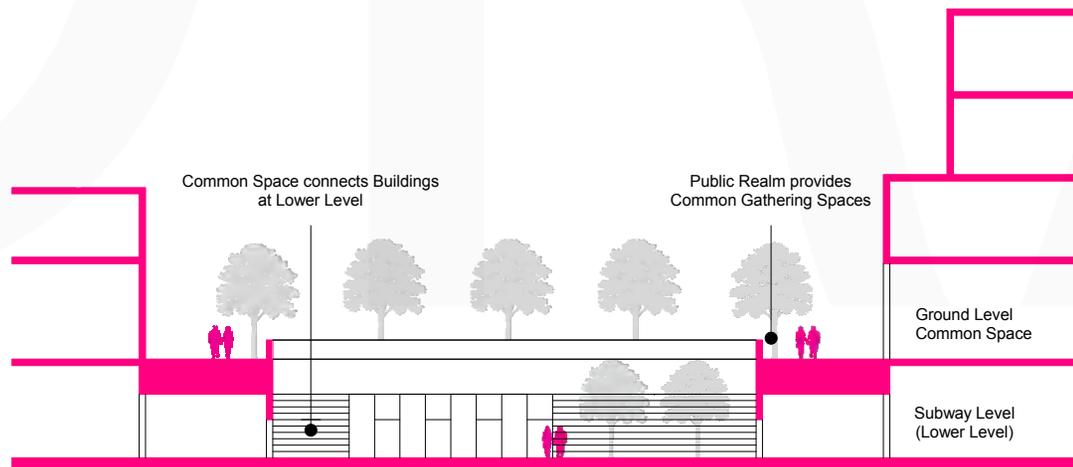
Spaces for collaboration can be created within buildings, in connections between buildings, and in outdoor spaces.
